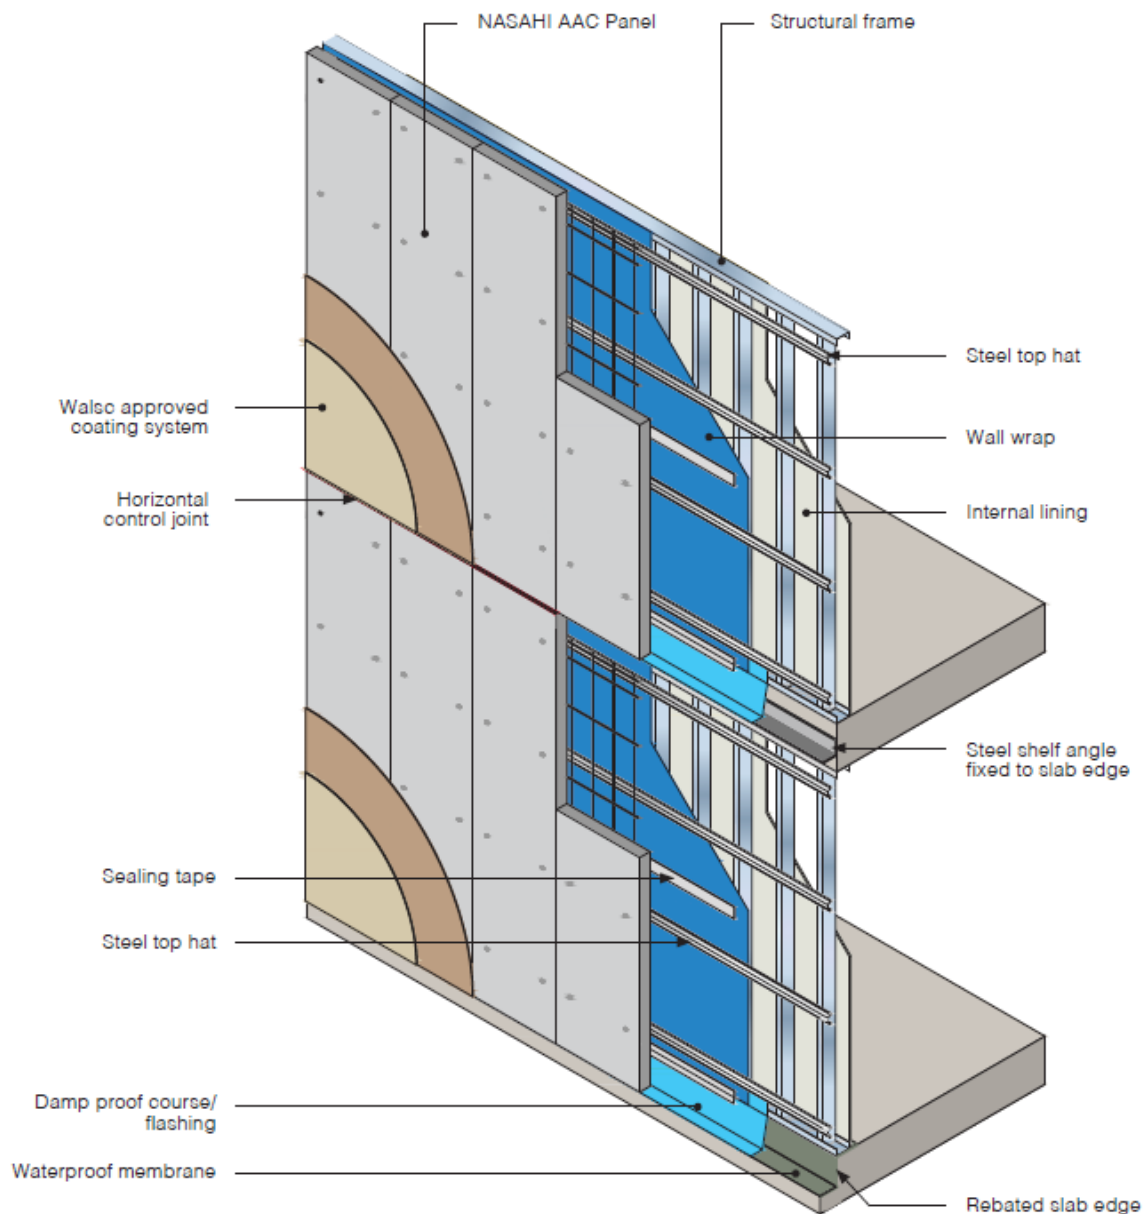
Façade Wall System Overview (courtesy of WALSC AAC Design & Installation Guide)
